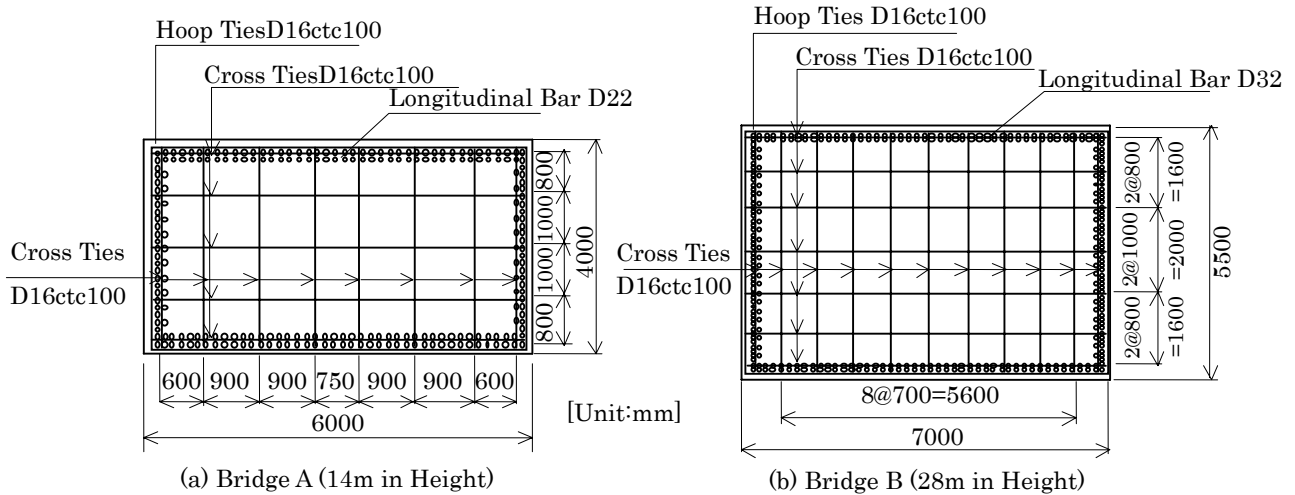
Sectional Area and Bar Arrangements of the Bridge Piers Designed
